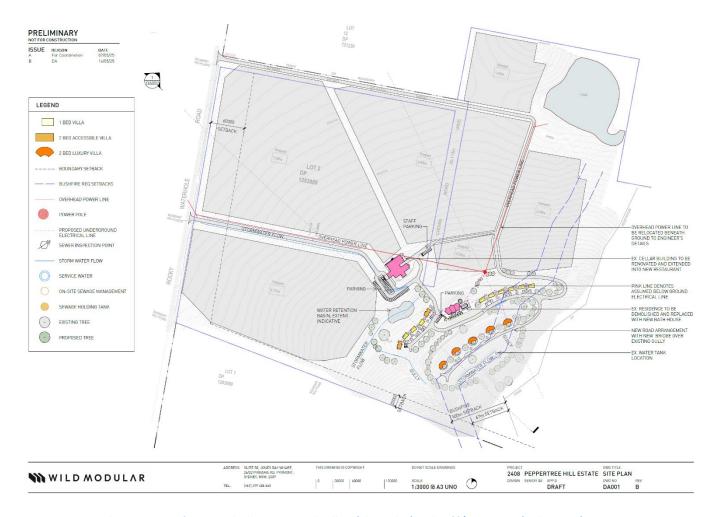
Site plan. Location of proposed villas, existing dwelling (The Lodge) and Café/restaurant (Cellar Door)
